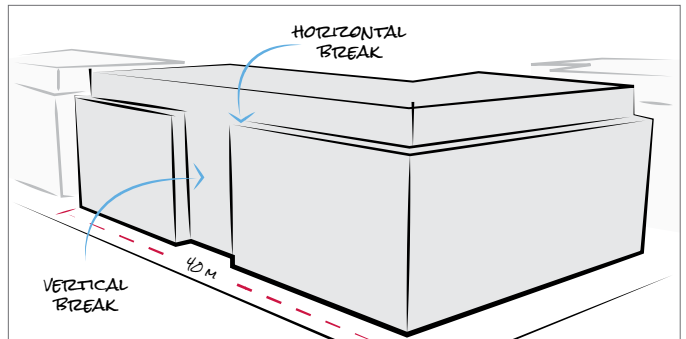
Buildings over 40m in length should incorporate a significant horizontal and vertical break in the facade (4.1.2 c).
